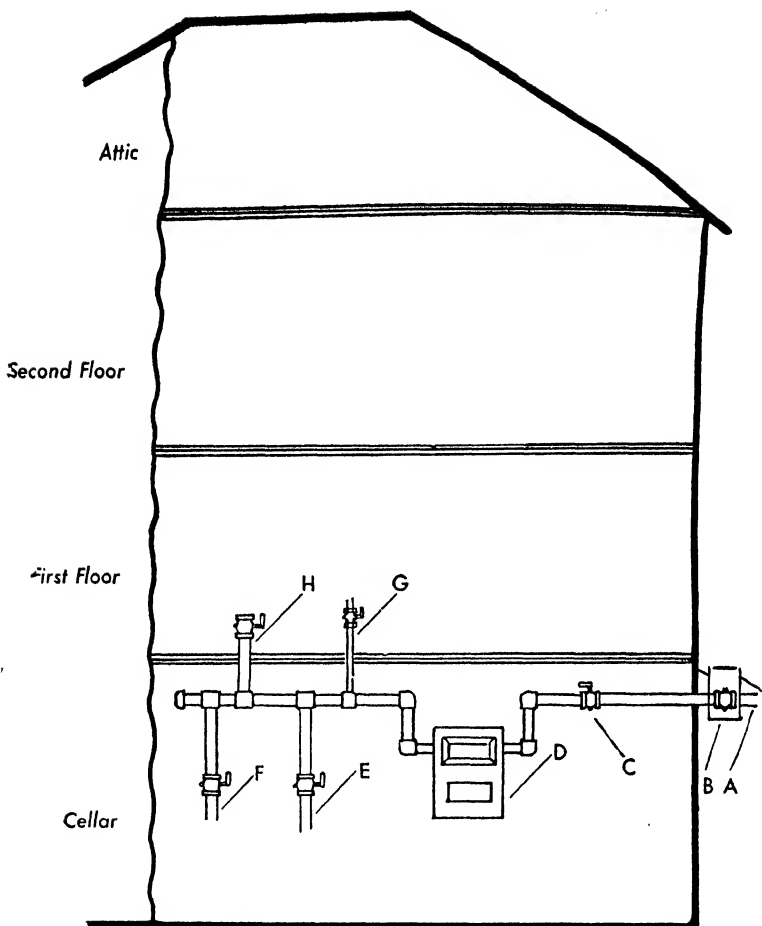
House Diagram Showing Arrangement of Gas Piping
